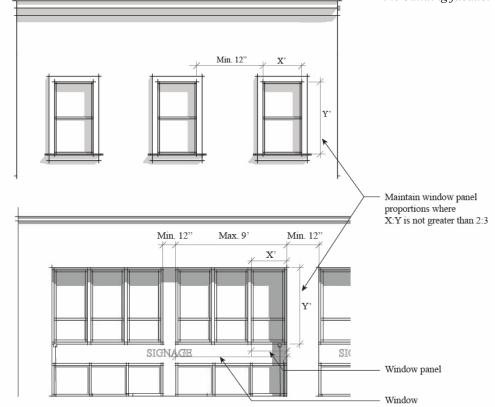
Upper floor window panels shall have a vertical proportion.
